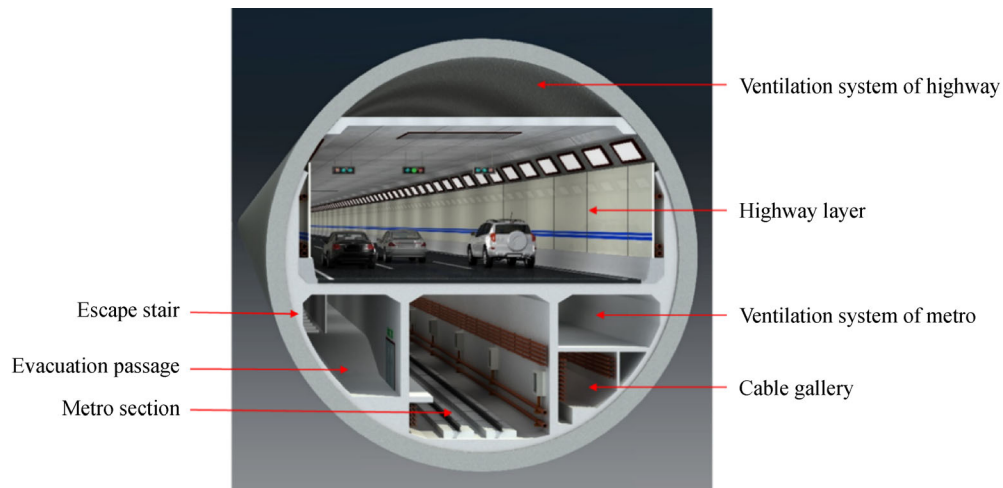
Inner structure layout of horizontal section in Sanyang Road Cross-river Tunnel with combined highway and railway construction
